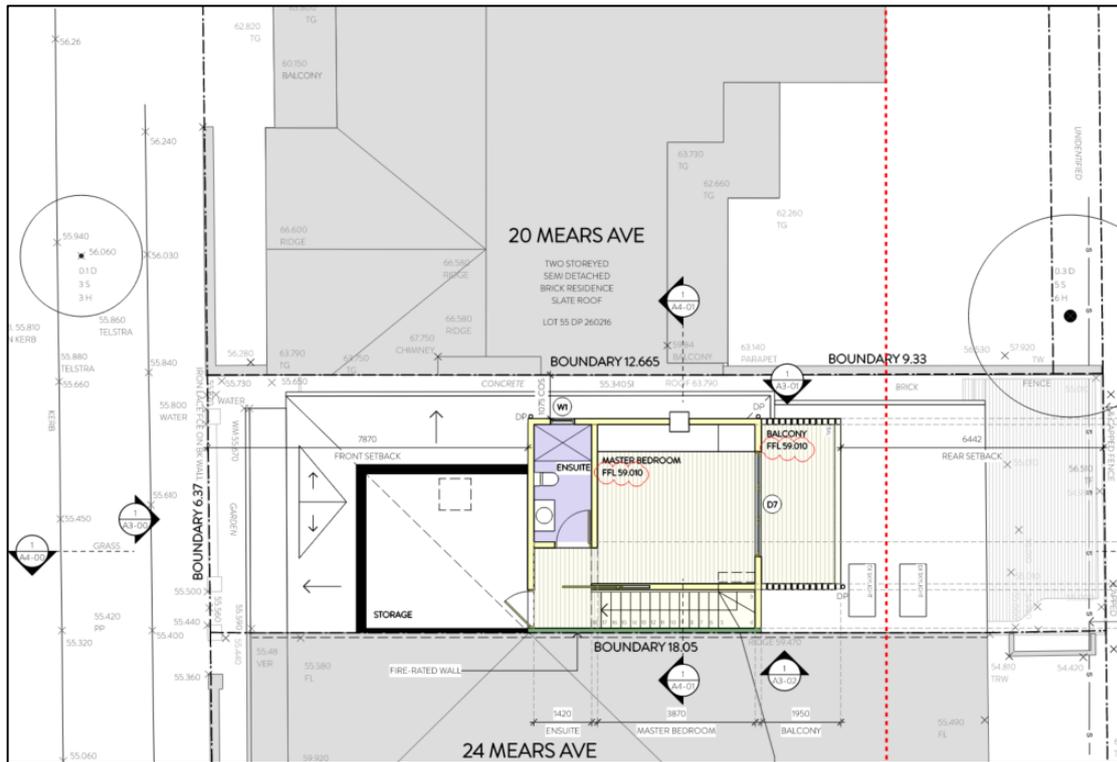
Predominant rear setback alignment shown on proposed first floor plan
